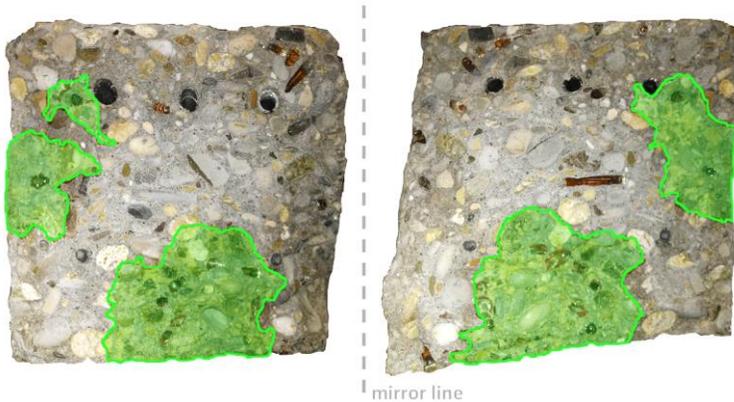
split cracked plane of a concrete specimen containing 36 pressurized capsules per litre, where water could flow between healed areas (in green).
